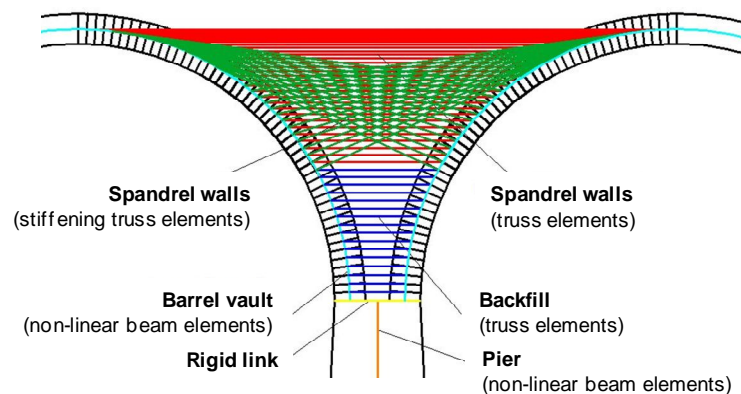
Fiber beam model: detail of the representation of backing and spandrel walls by means of non-linear truss elements.
